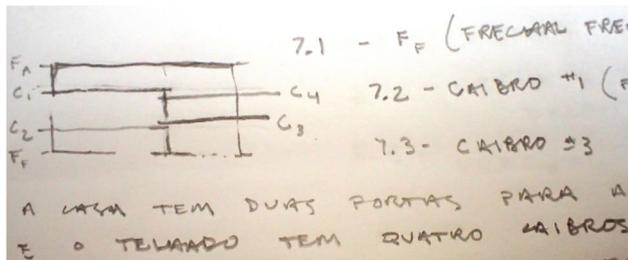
Author's notes, 2014: "The house has two doors...and the roof has four rafters..."
